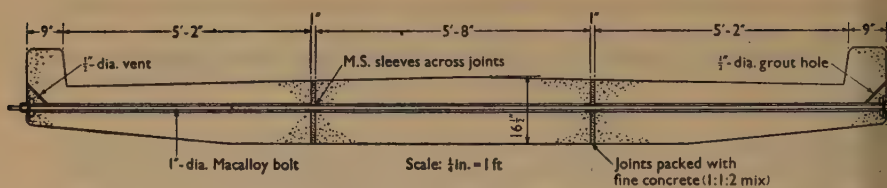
TYPICAL DETAILS OF CONNEXIONS BETWEEN ROAD SLAB UNITS
